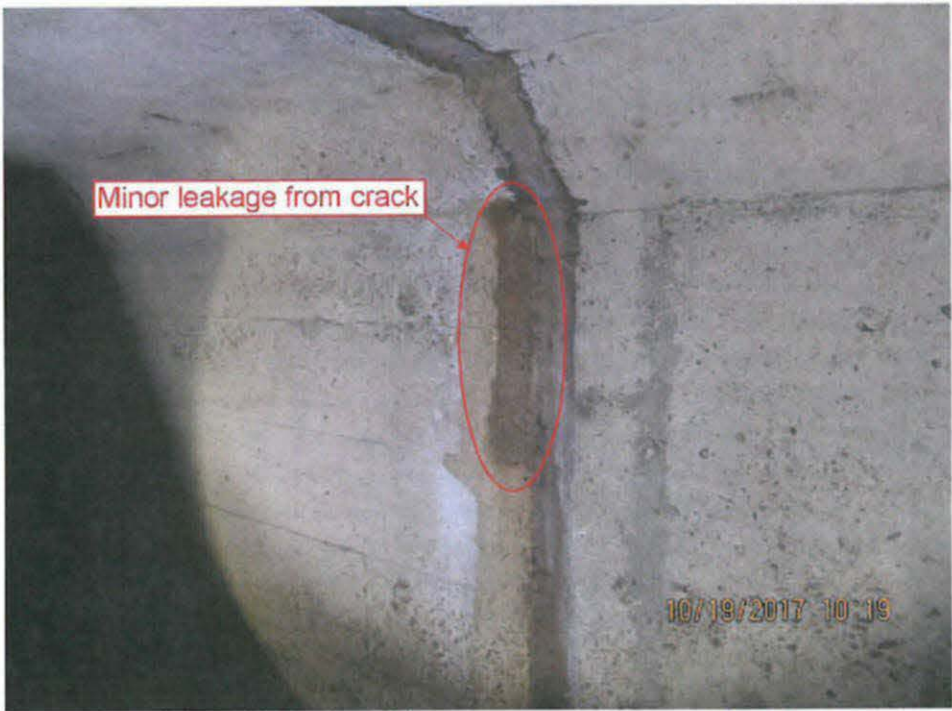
TYPICAL CONDUIT JOINT AT ADDICKS OUTLET STRUCTURE.
